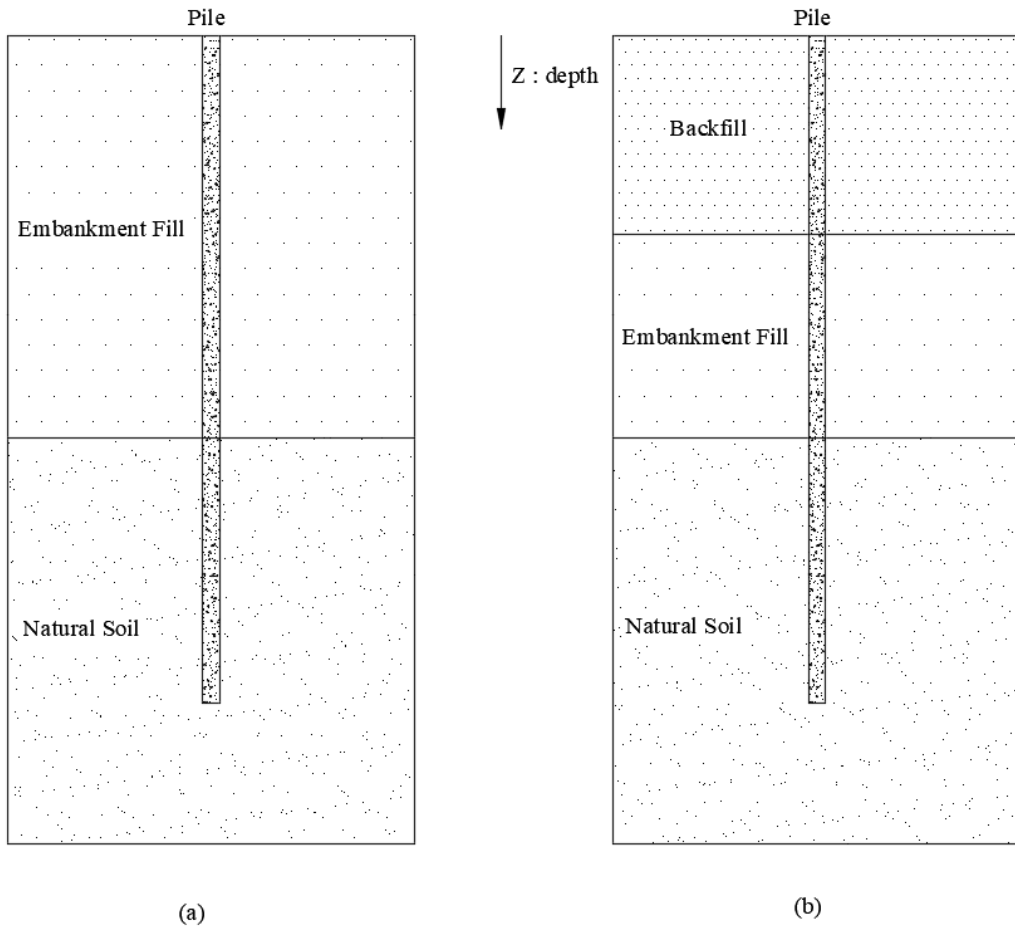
Cross section of the single pile-soil model (a) without granular backfill (b) with granular backfill
